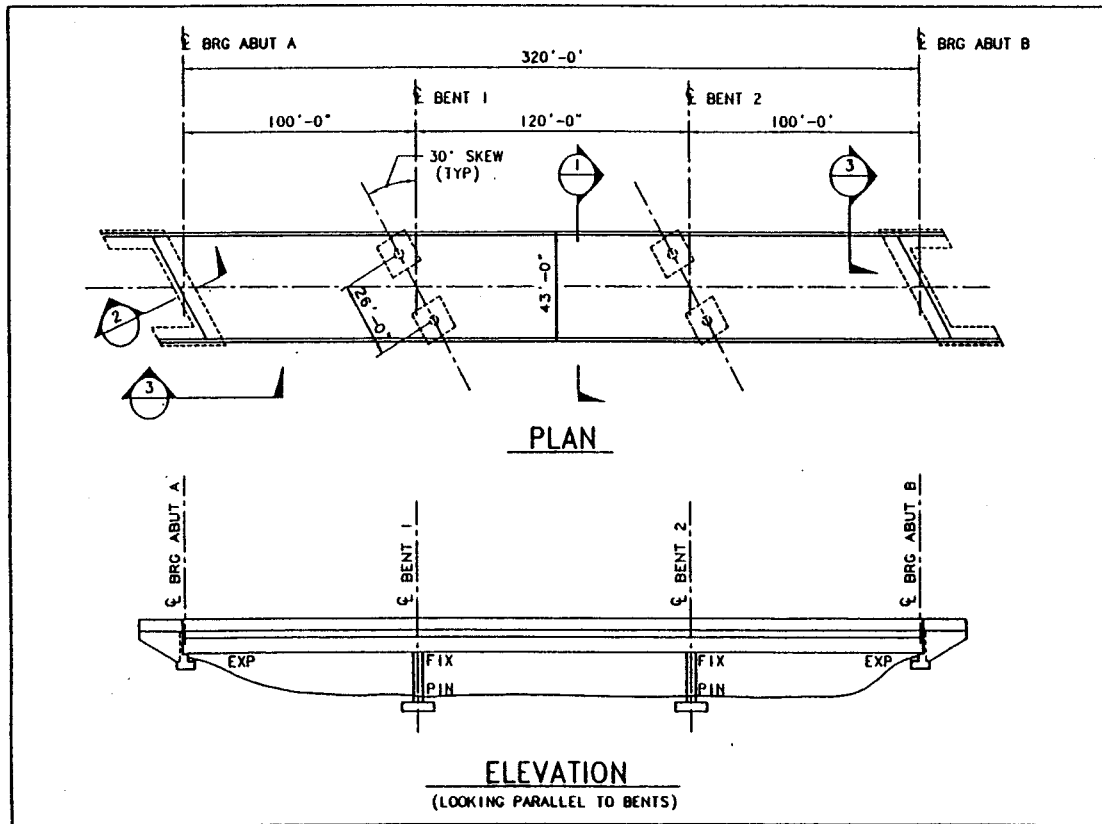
Elevation and Plan Views of the Typical Three-Span Continuous Concrete Bridge Taken from FHWA (1996).
